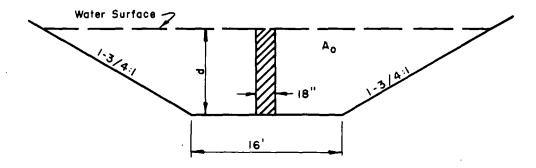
Cross-section of channel showing center bridge pier.
